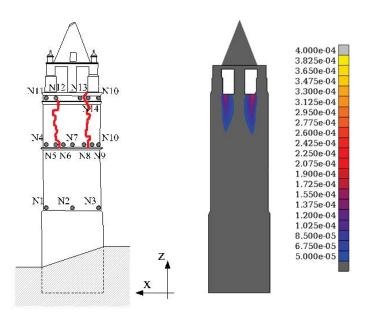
Mogadouro tower north façade: surveyed (on the left) and numerical (on the right) cracking pattern.
